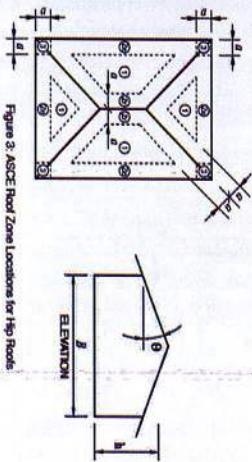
ASCE Roof Zone Locations for Hip Roofs
